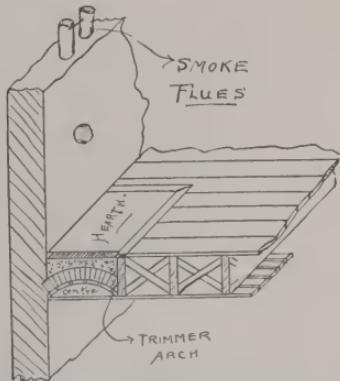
SECTION THROUGH FLOOR AT HEARTH.
